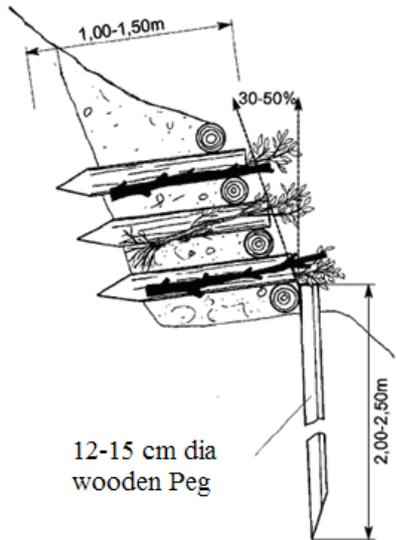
Typical section of a vegetated wooden log crib wall at the toe of the slope (Florineth, 2004)
